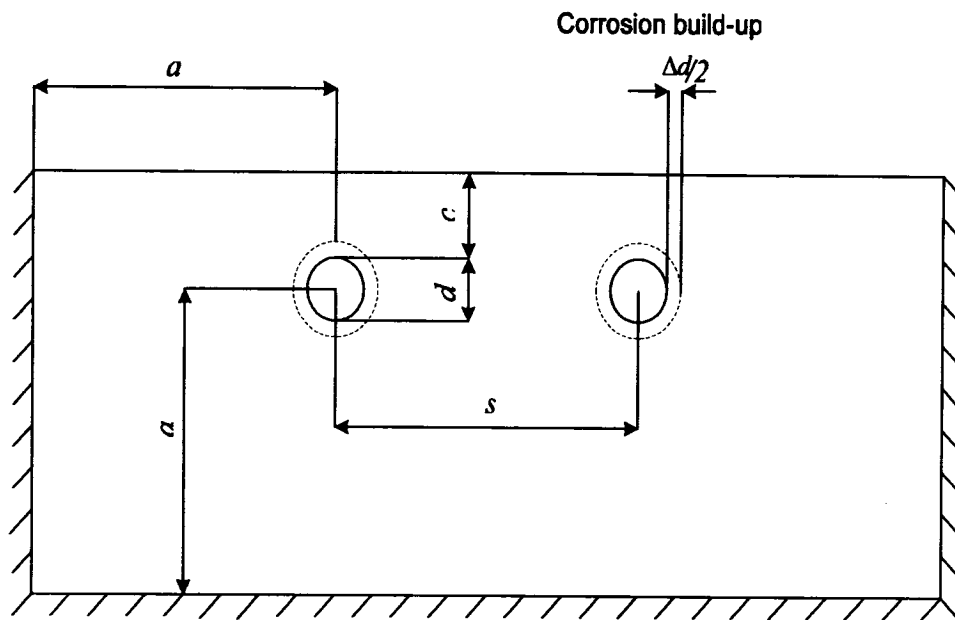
Geometry of bridge deck model (adapted from Zhou (2005))
